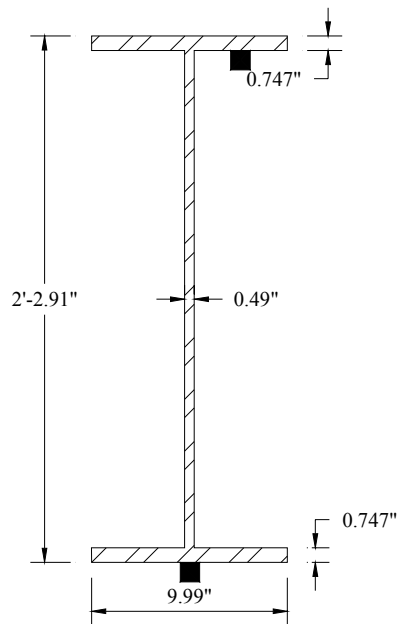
Cedar Creek Bridge: Cross-sections of the bridge.
